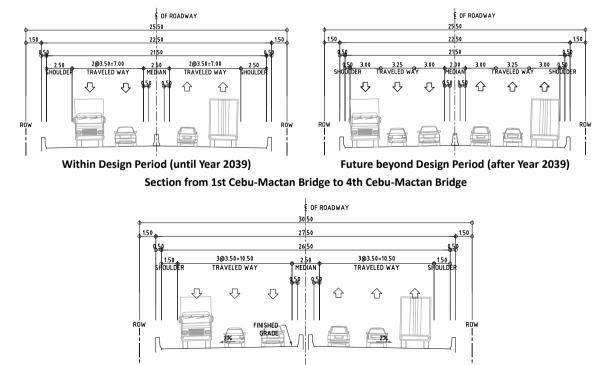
Typical Cross Sections of 4th Cebu-Mactan Bridge
